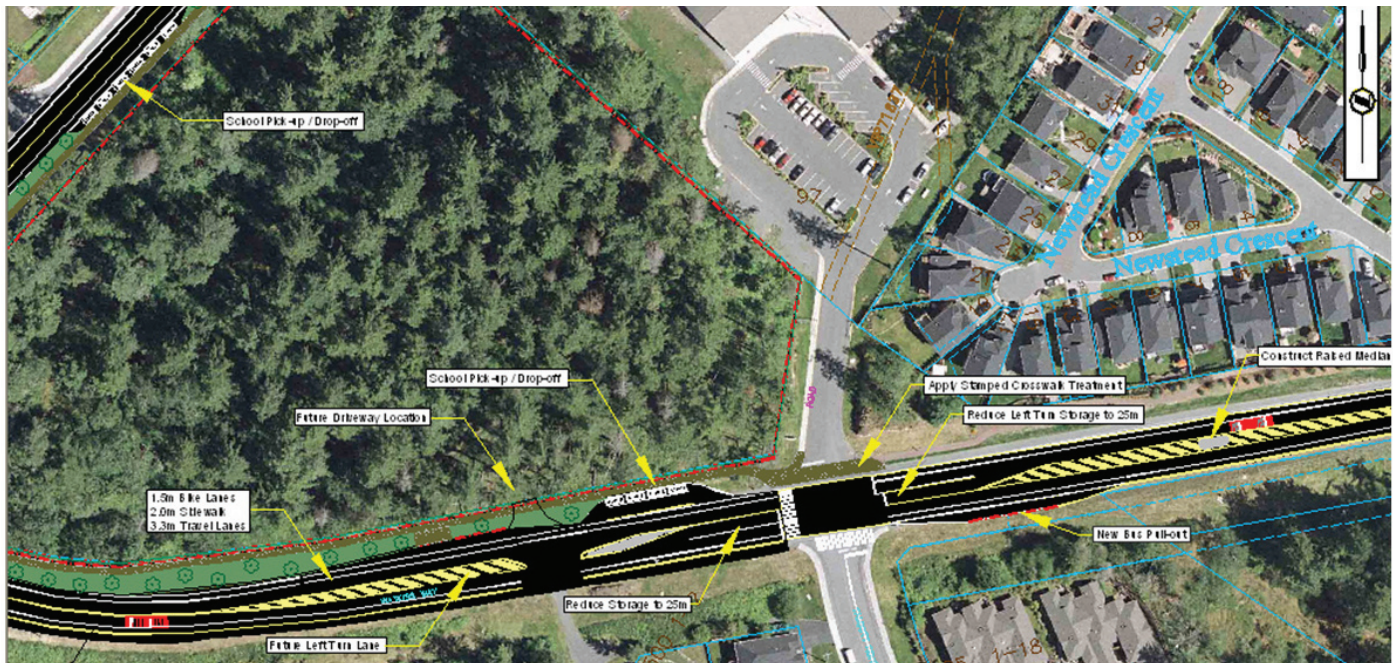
Watkiss Way from Burnside Road West to Helmcken Road
